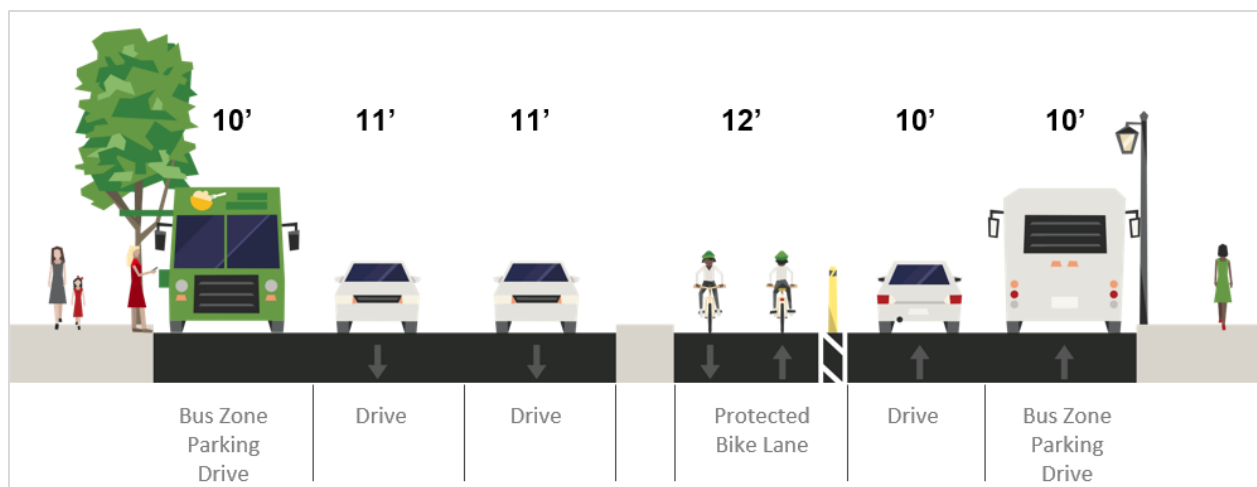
Typical section view, proposed condition, G St NW to 18th St NW. Note: the protected bike lane will be center-running through this section of the corridor, but it will not always be on the same side of the median.
